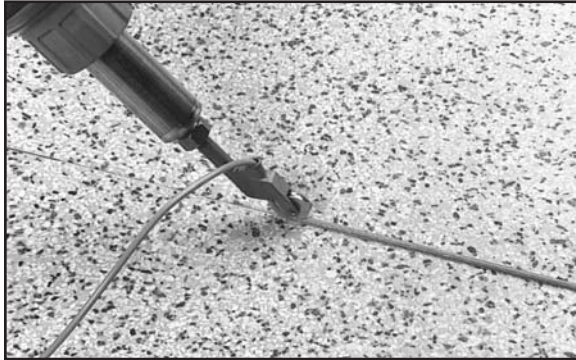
Heat welding nozzle equipped with an integrated welding rod roller.
